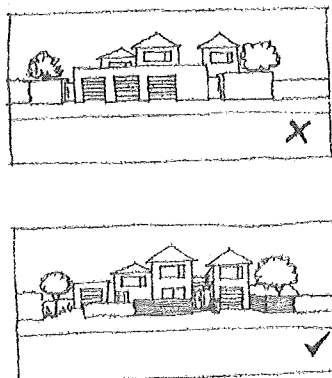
Eliminating blank walls and rows of garages creates a more pleasant streetscape.
